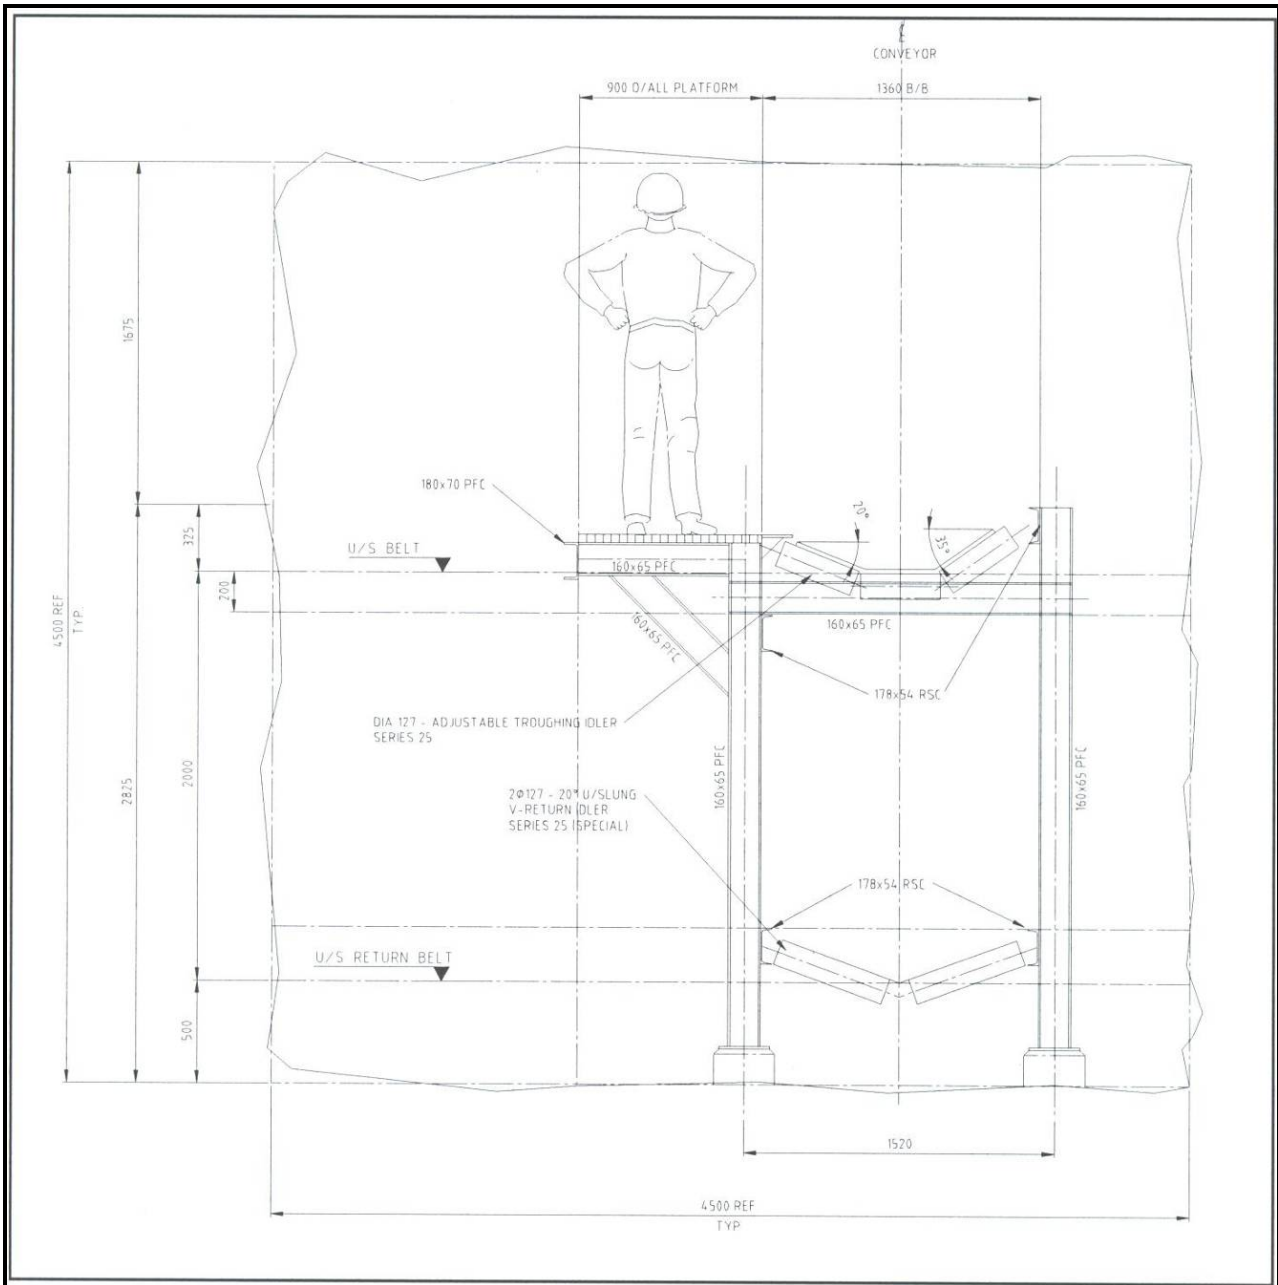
Getting off the Belt (going out the mine) – Section through Platform (Top Belt – Modifications)
